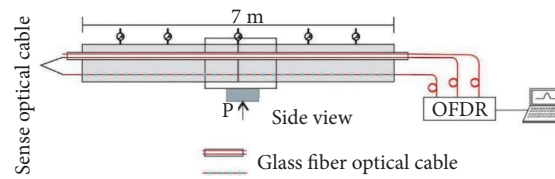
Layout of optical cable on the surface of CPCSP.
